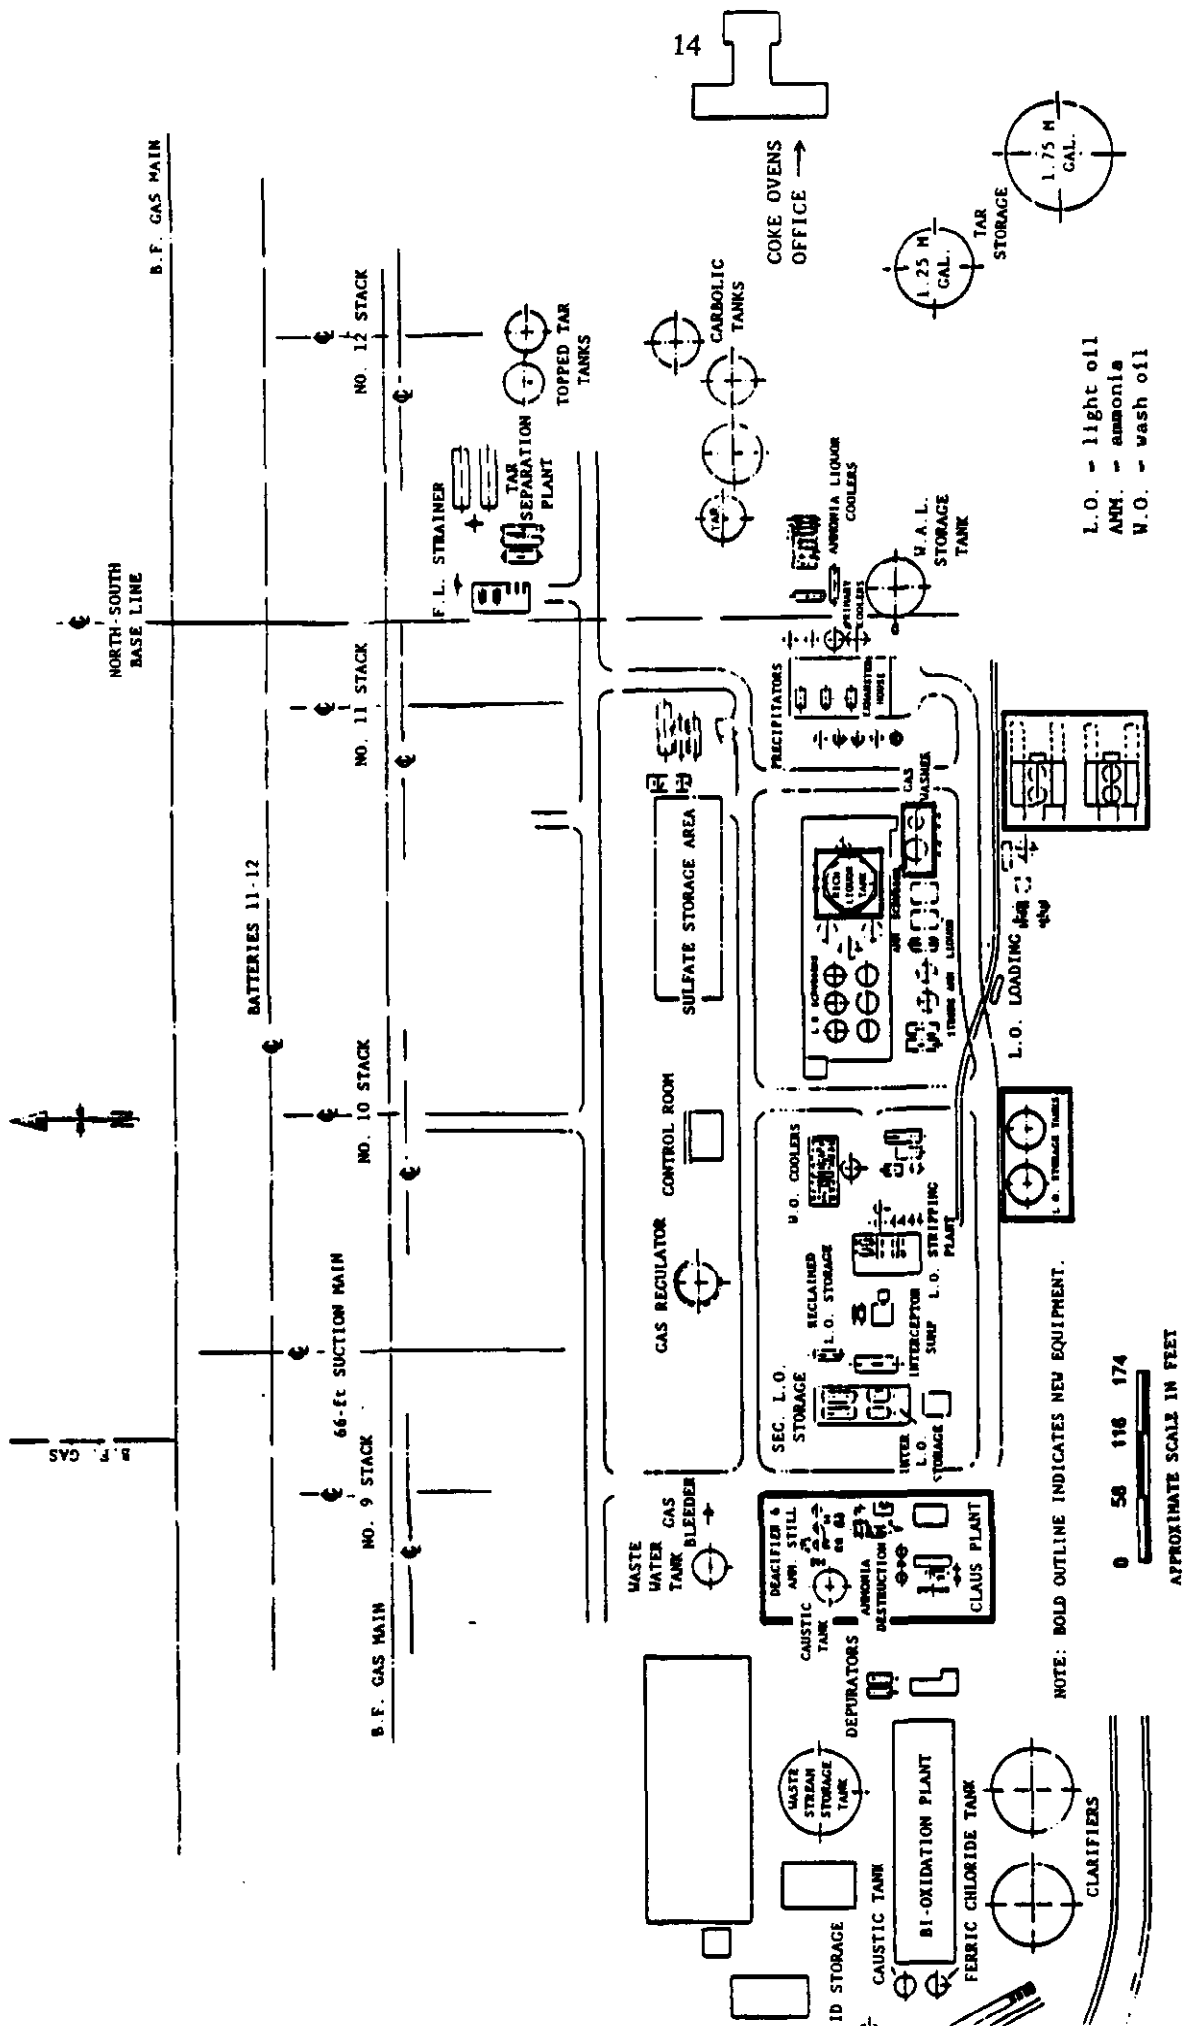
Layout of new equipment to be installed as part of the coke oven gas cleaning demonstration project at the Bethlehem Steel Corporation, Sparrows Point Plant. Source: "Environmental Information," *The Coke Oven Gas Cleaning Project* at the Bethlehem Steel Corporation, Sparrows Point Plant, Vol. 4, Environmental Resources, Inc., April 21, 1989.
